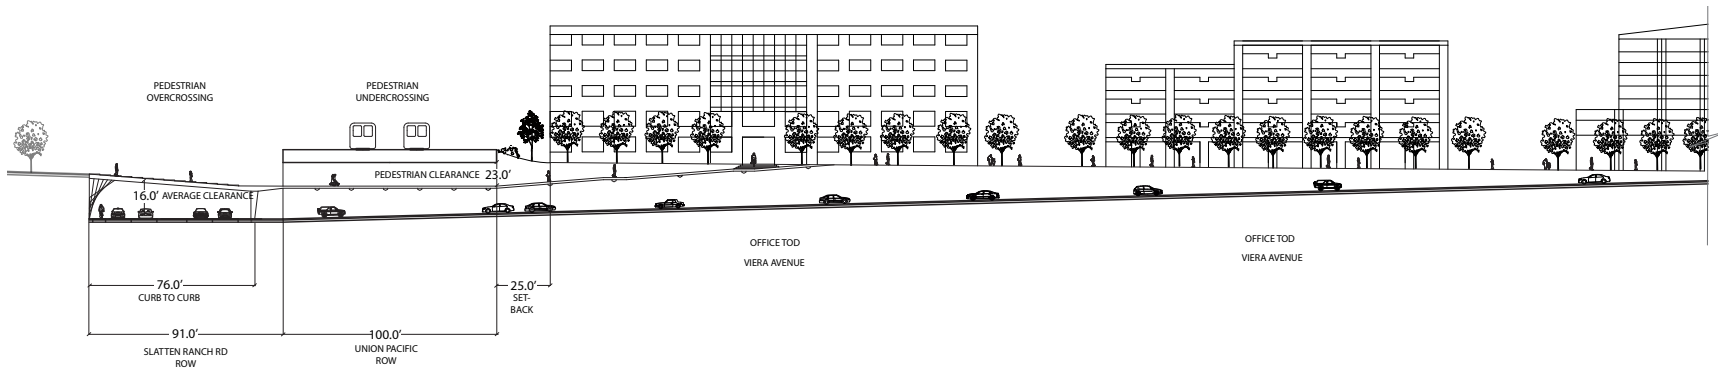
shows a detailed view of the pedestrian bridge over Slatten Ranch Road, and the straight connection to a pedestrian/bicycle walkway under the railroad. With the proposed undercrossing, there is an opportunity to make a straight direct connection from the eBART station to the Transit Village without extensive stairs, switch-back ramps, or elevators.
